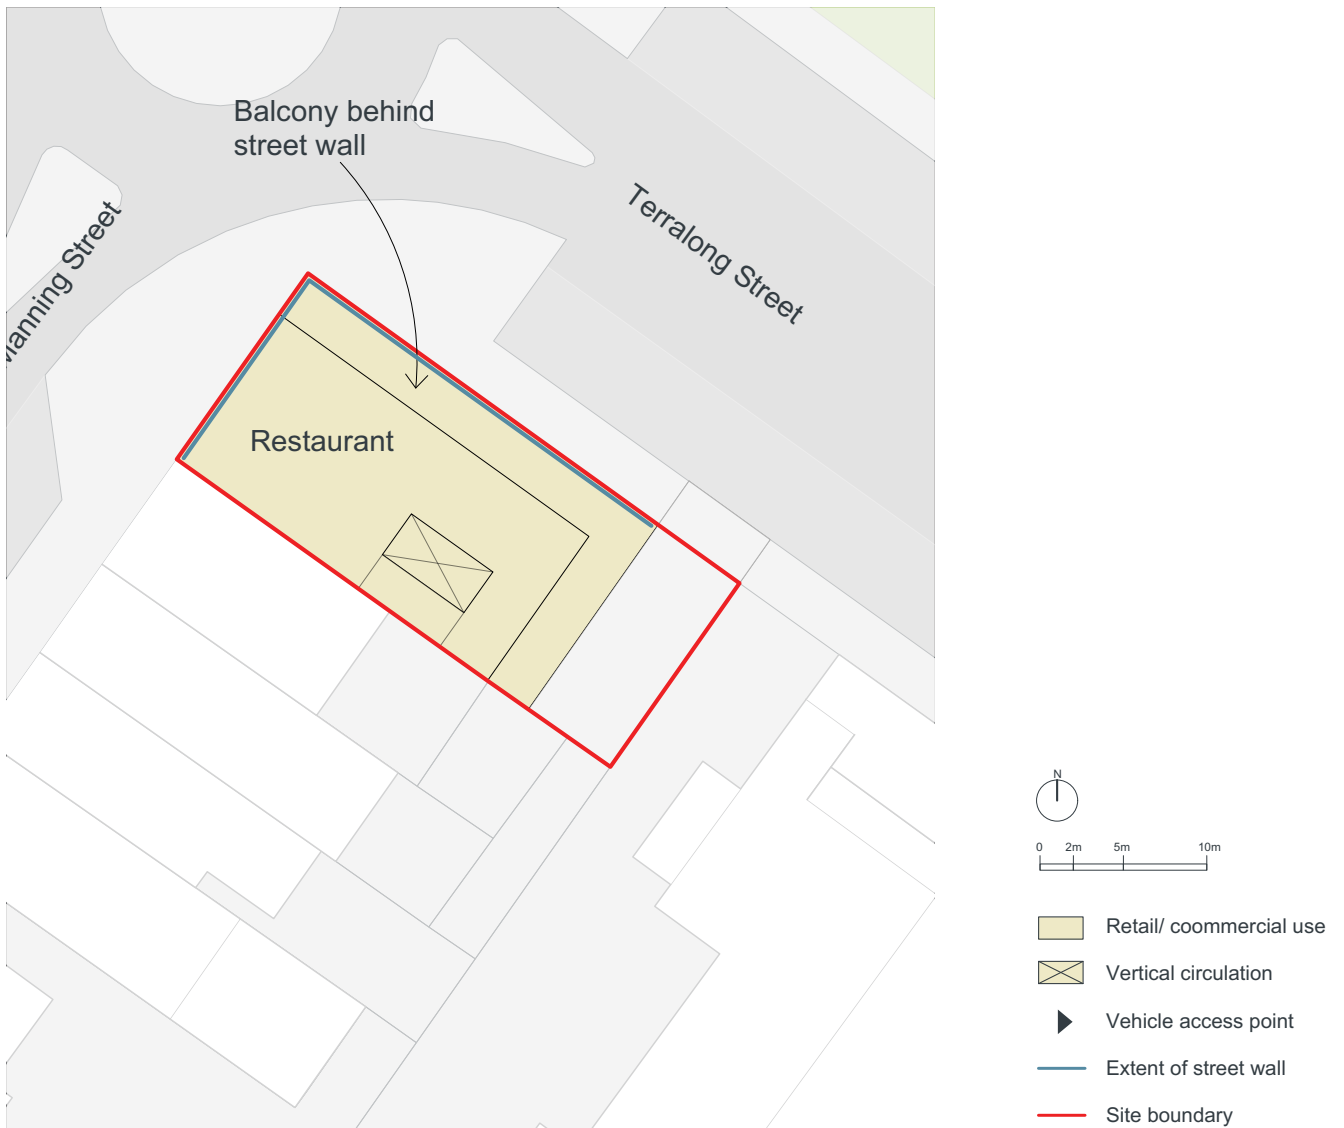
Commonwealth Bank - Site Layout Plan Level 1
